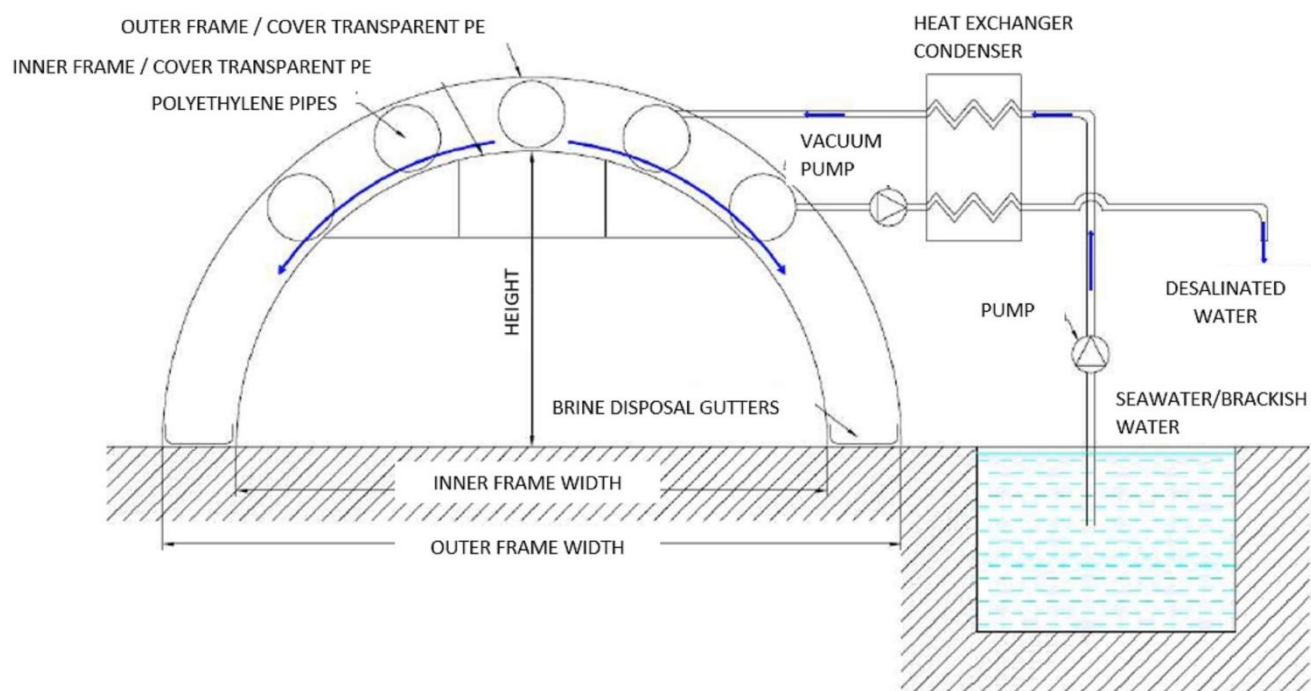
Vertical section of the greenhouse construction, with the solar desalination system installed on the roof.
